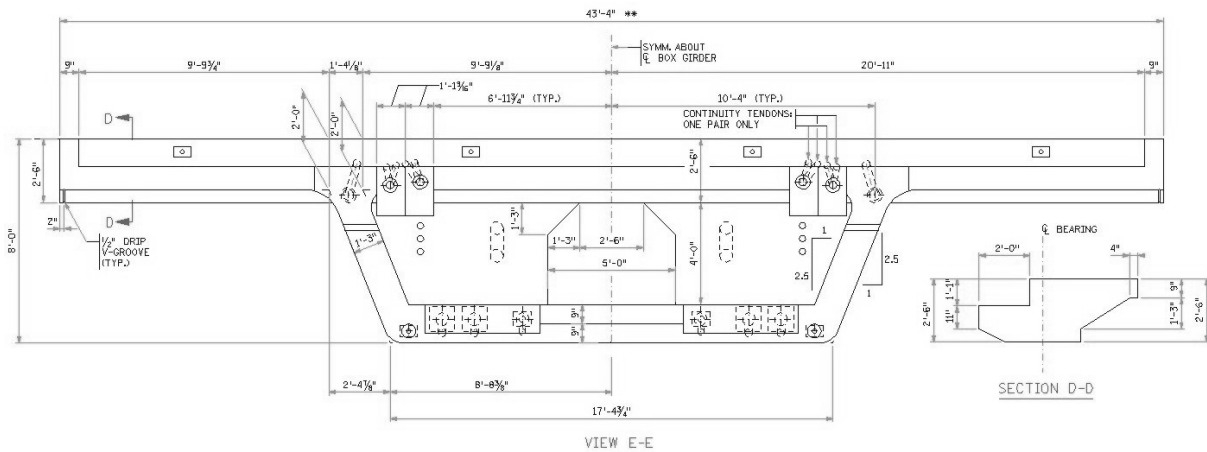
Abutment Segment Looking at Expansion Joint Face.
